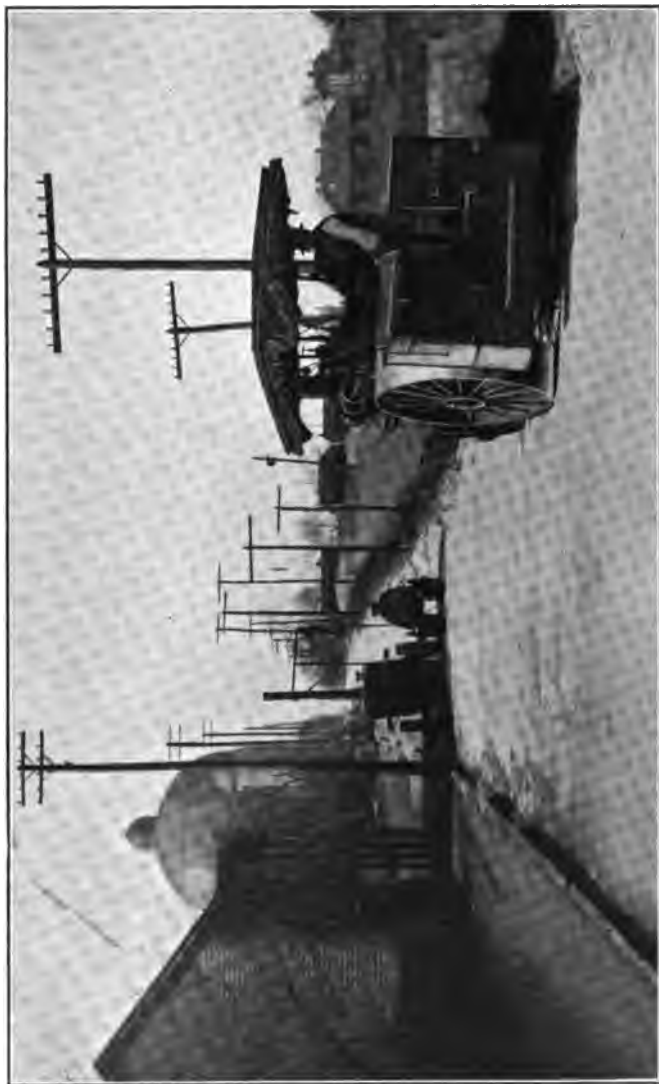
Paving West Hunter Street. Atlanta Gas Light Co.'s road tar binder.
